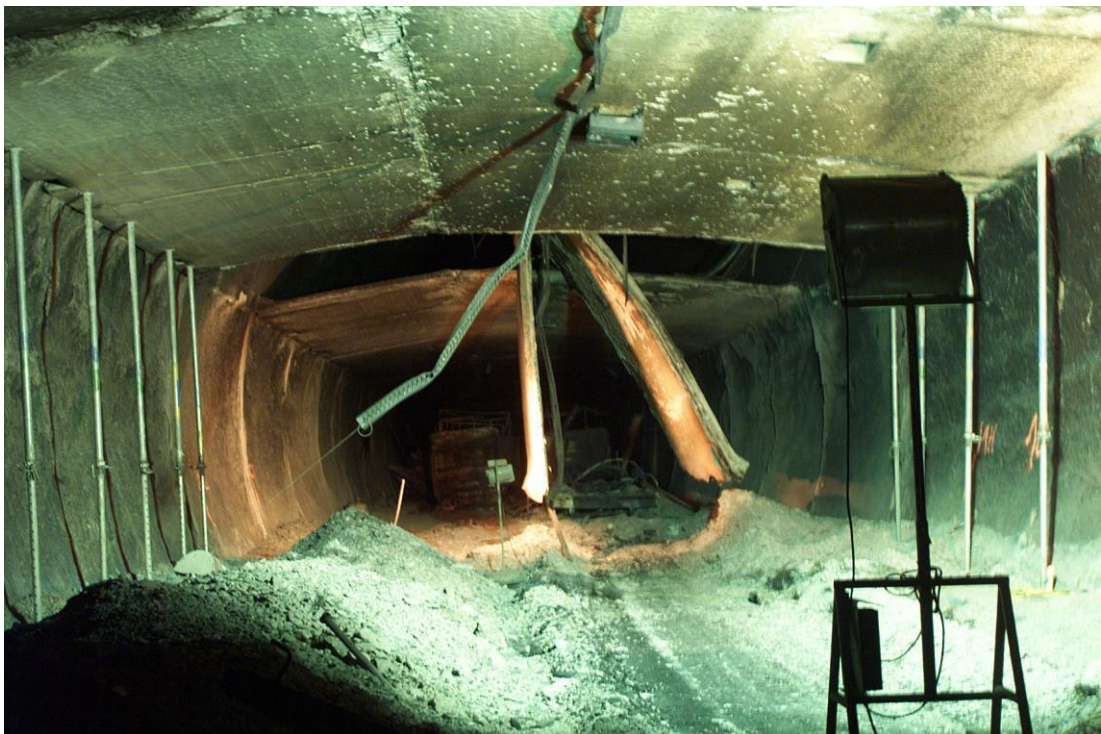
Indication of concrete spalling: chunks of concrete on the road surface.
